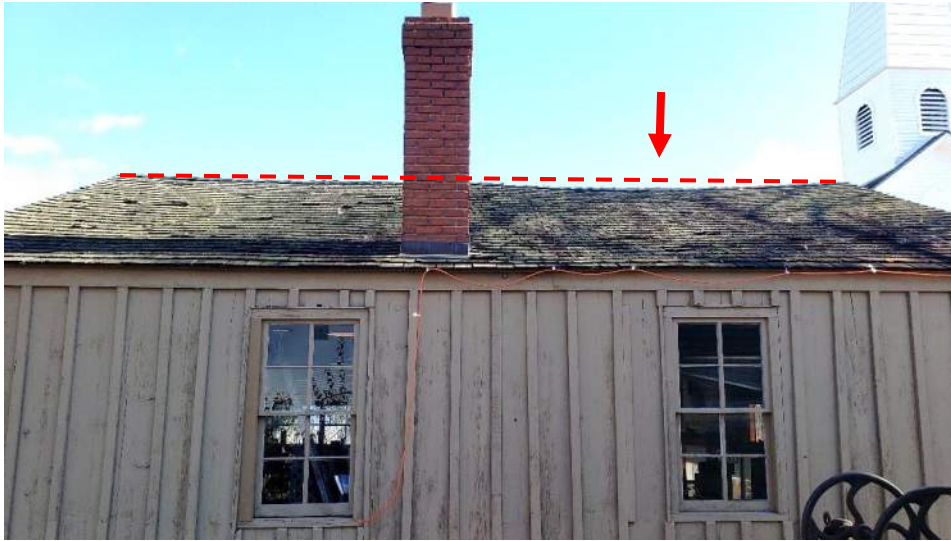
Visible deflection of the roof viewed from the west side of the building.
